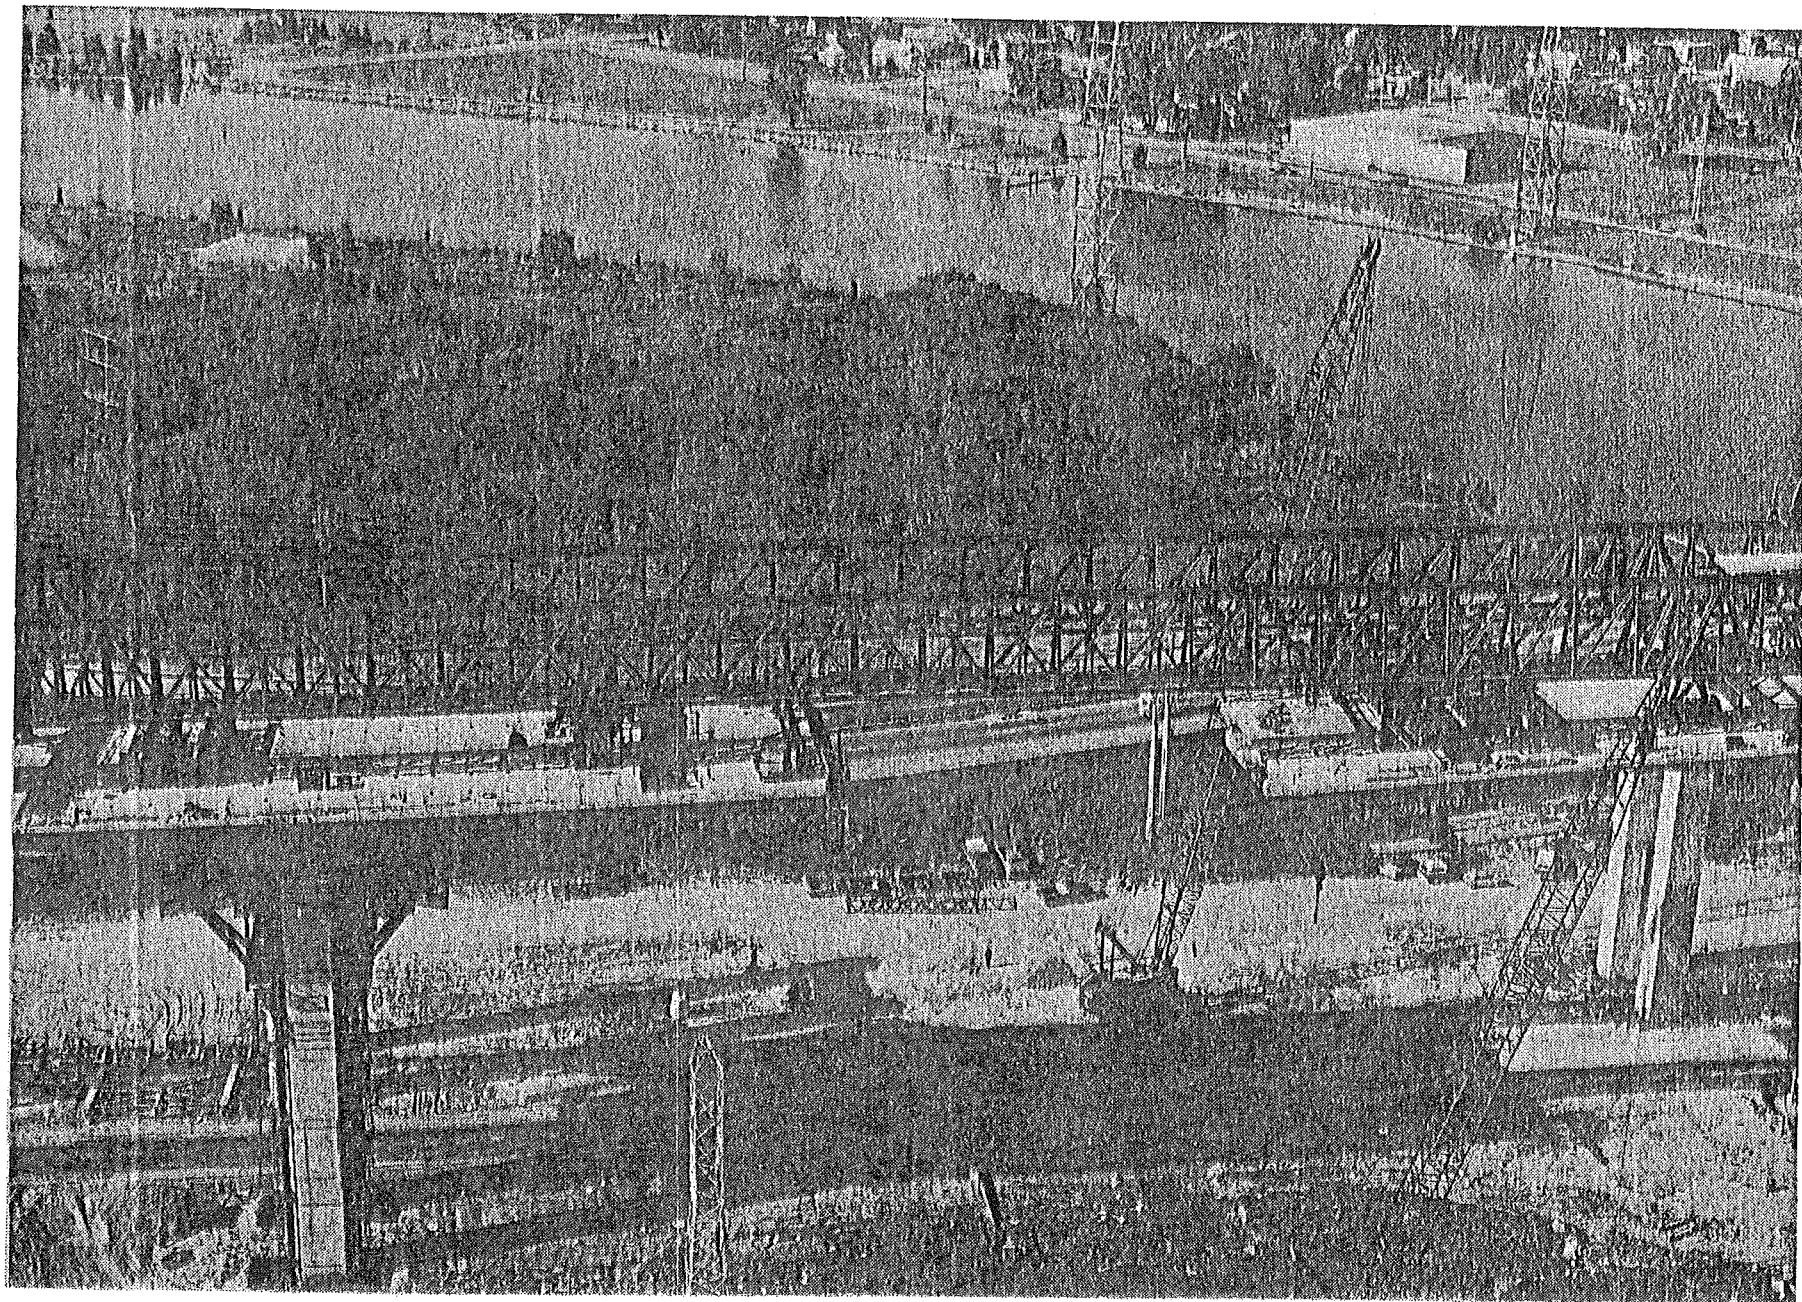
Aerial view of Launching Girder at Piers 10N and 11N
